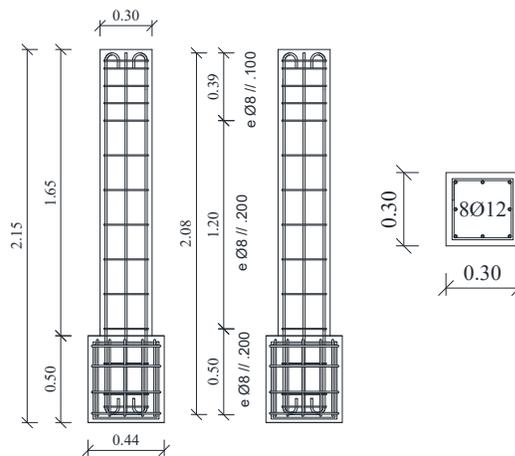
Geometry and reinforcement detailing (dimensions in m).
